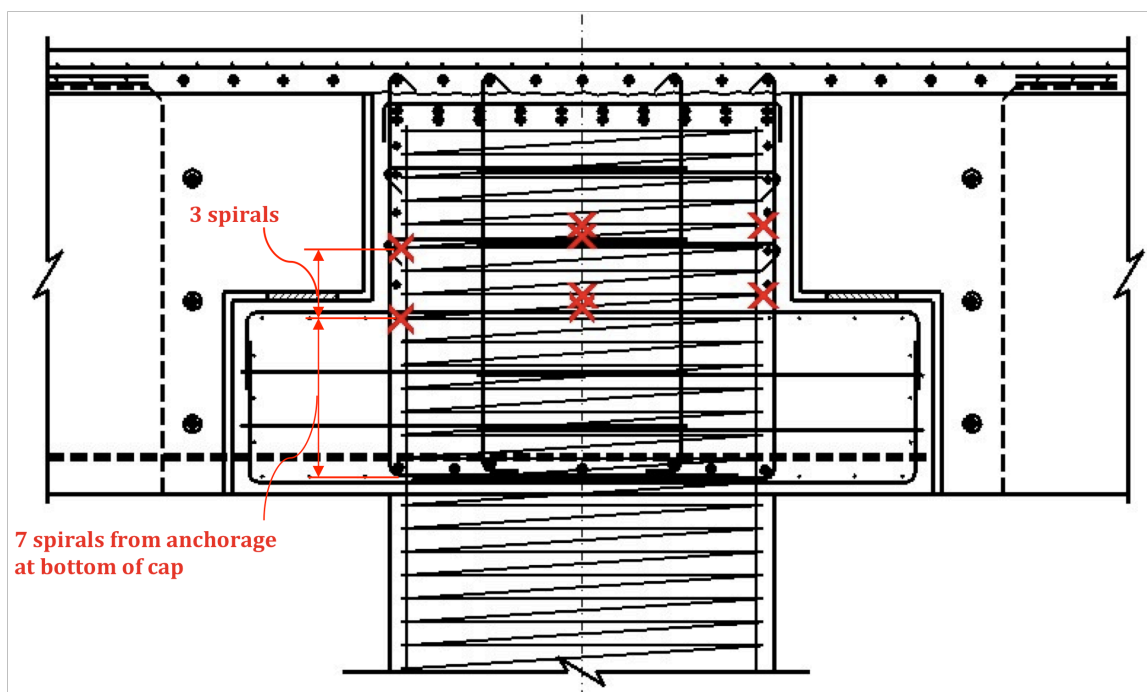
Column-to-Cap Beam Spiral Instrumentation within the Joint
